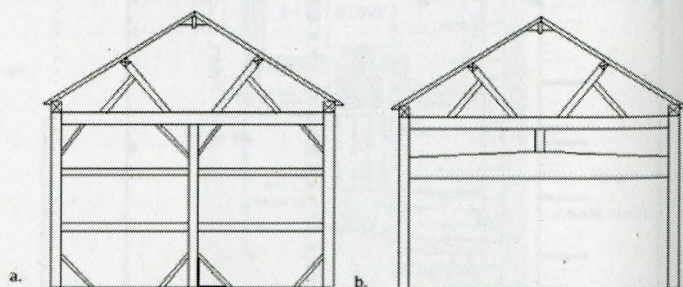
Structural Systems: a. the wall framing from the North facade and b. the
